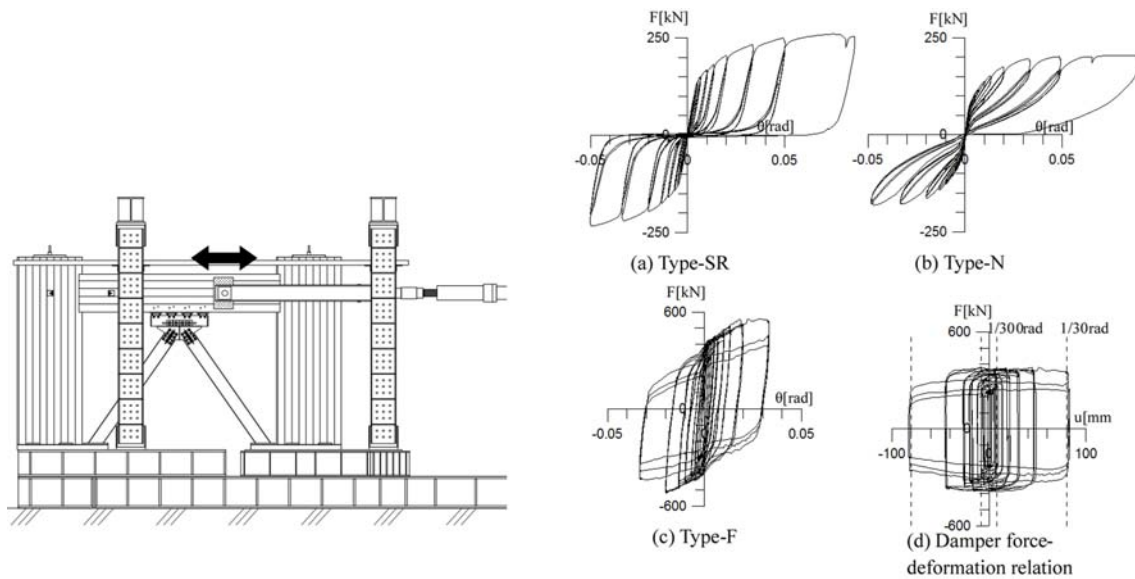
Force F - story drift angle θ relation of conventional frame(a) Type-SR), post-tensioned CLT rocking wall without damper(b) Type-N) with damper(c) Type-F and damper hysteresis(d) (Matsuda et al., 2017).
